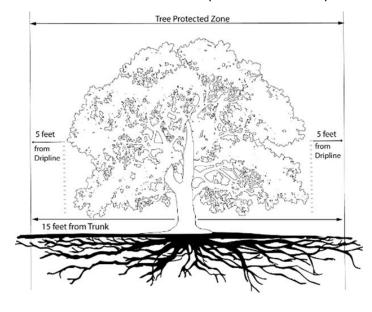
PROTECTED ZONE (ELEVATION VIEW)
